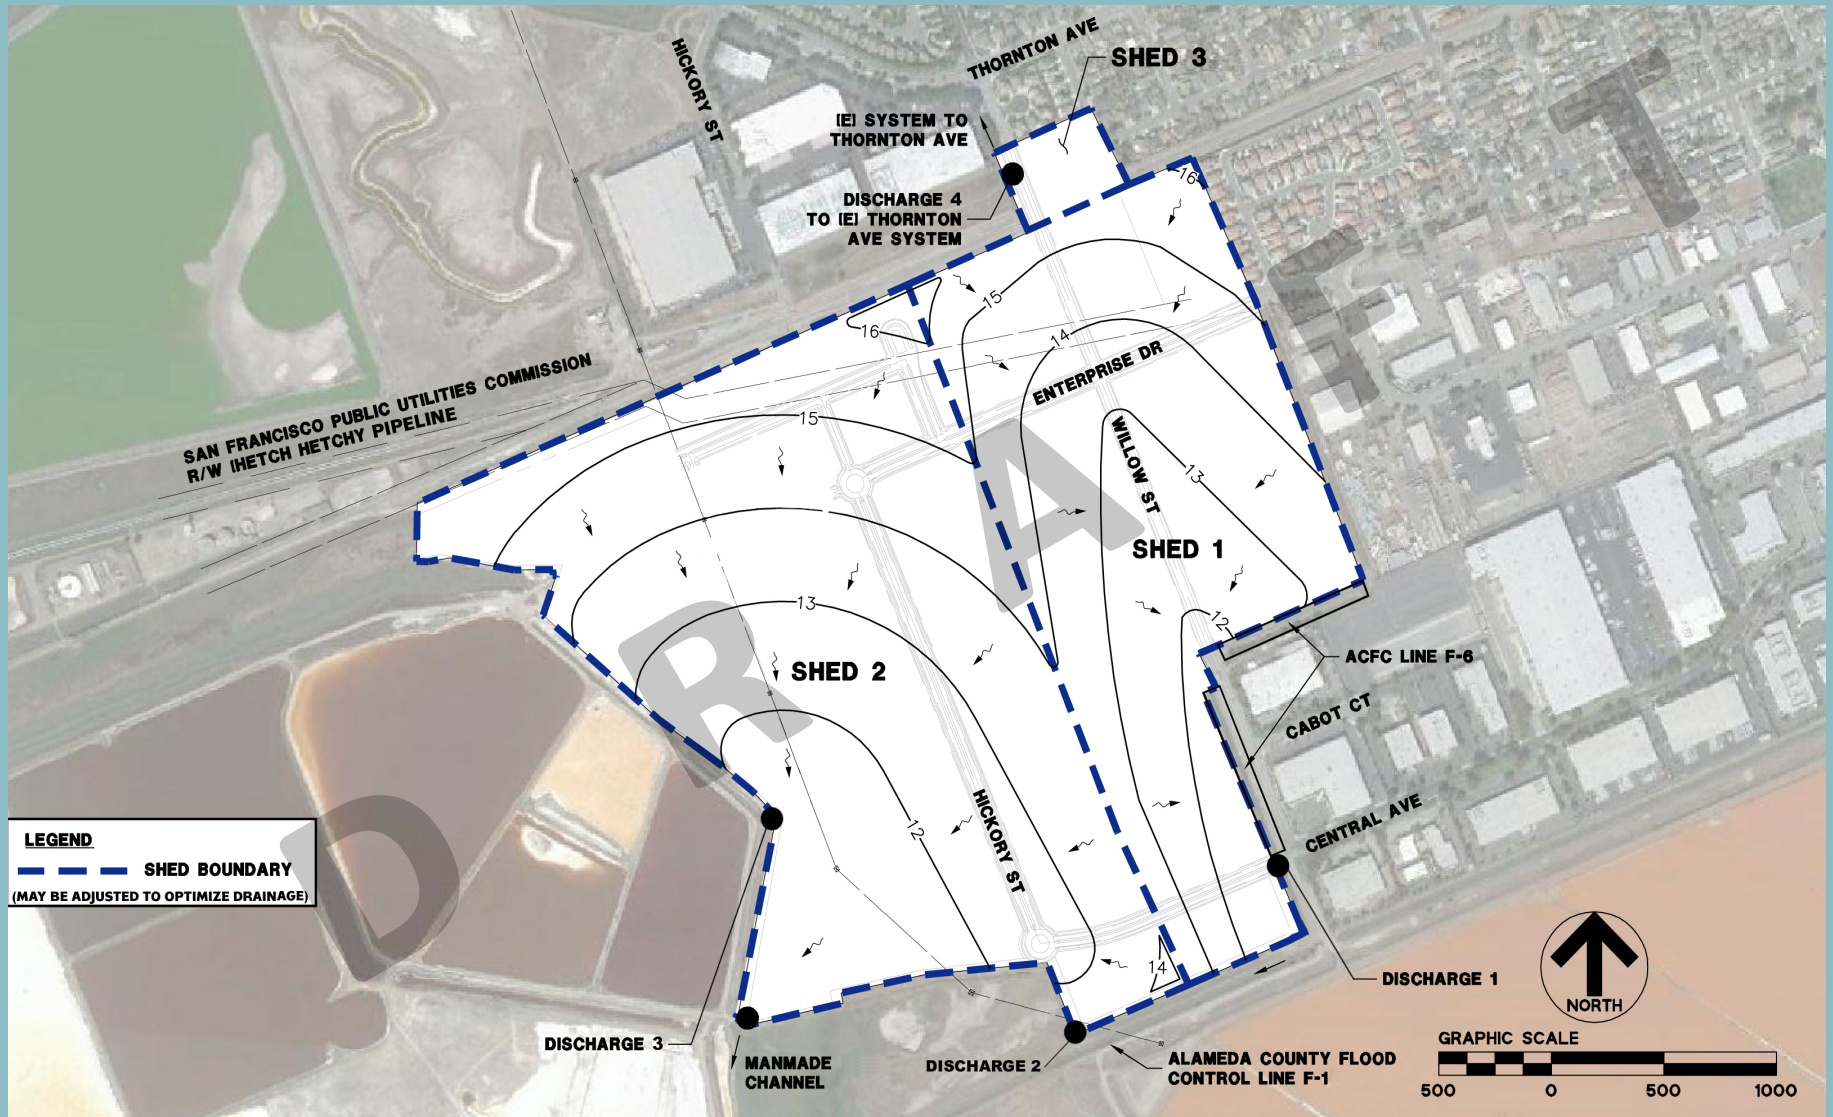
Conceptual Grading / Drainage Plan
